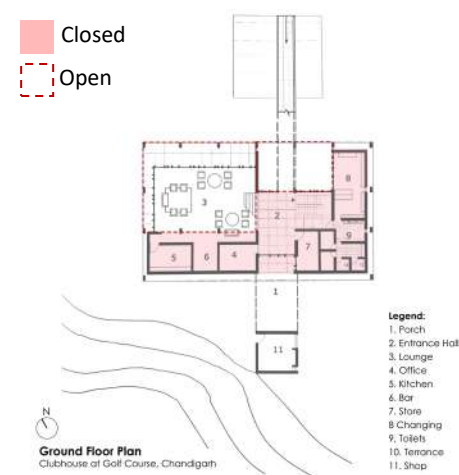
Plan of Clubhouse for Golf Course, showing the open and closed façade.
